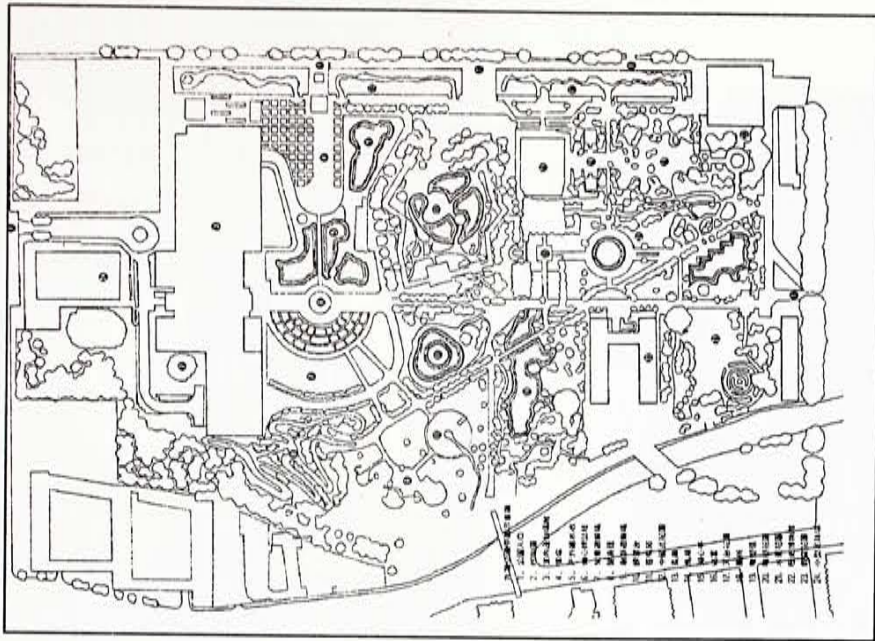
Master layout plan of Kowloon Park¹⁷
